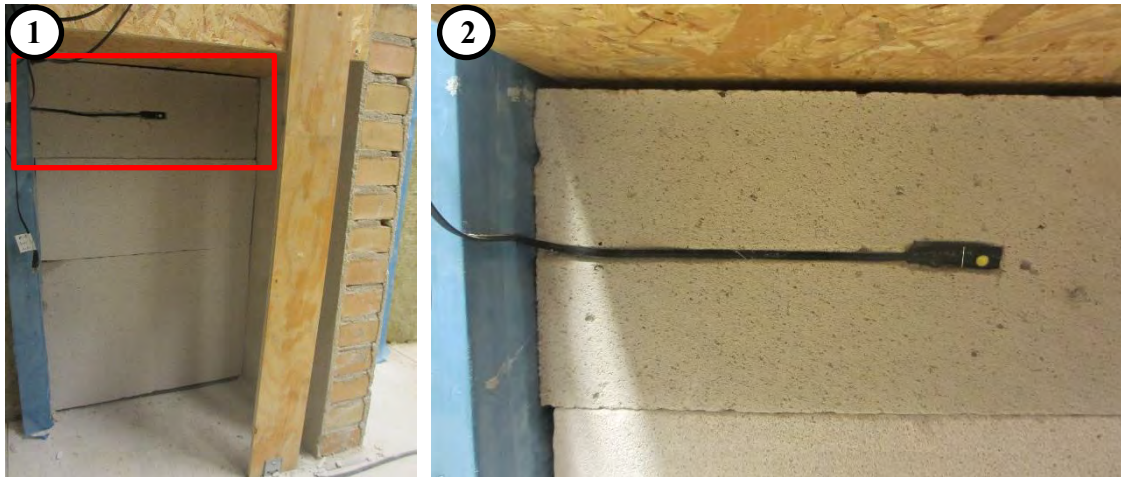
Installation of the AAC blocks in front of the wooden wall plate, below the wooden floor partition. 1) Lower part of the masonry assembly with Ytong Multipor in the lower part of the wall area, and AAC in the upper part. 2) Close-up of the sensor installed in the AAC block.
